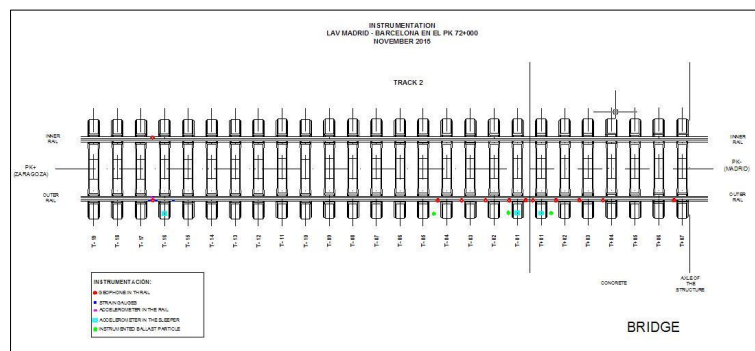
SKETCH OF THE INSTRUMENTED SECTION LOCATED AT 10 M FROM THE BRIDGE
